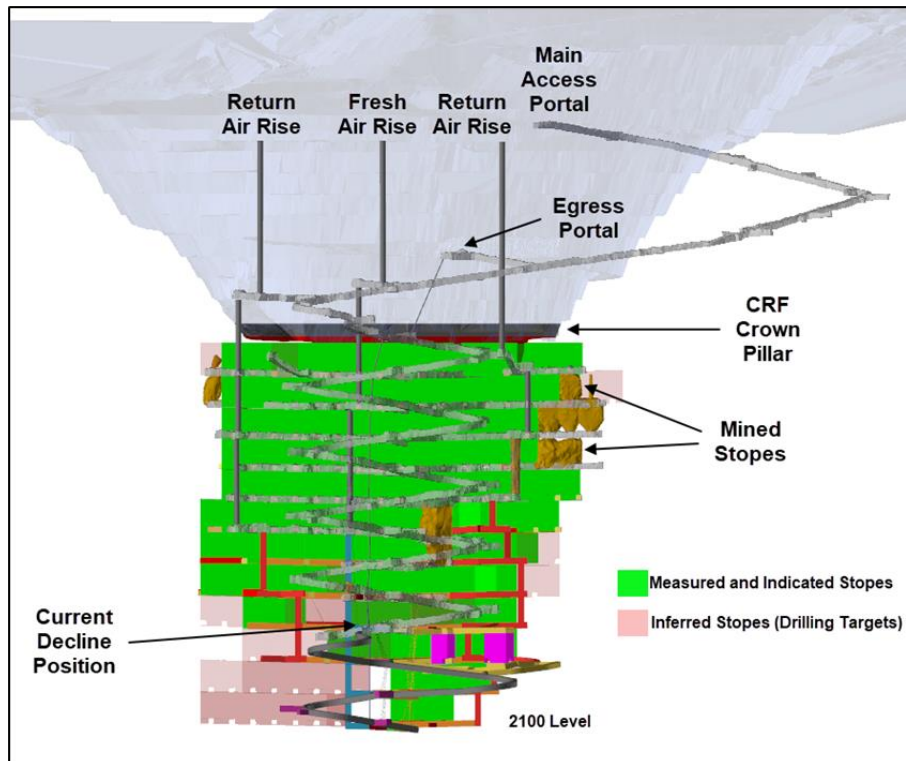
Underground Mine Design, Long-Section View Looking North-East
